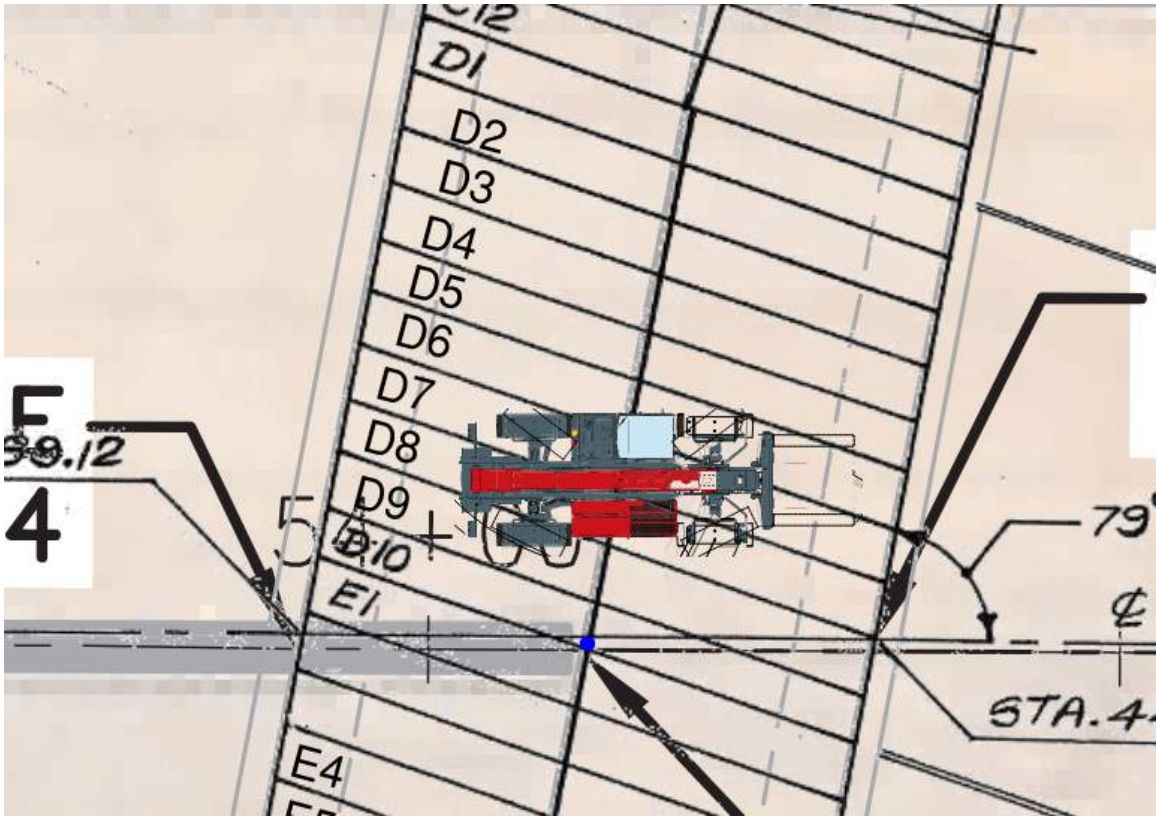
Position for Test 1 and Test 2 at Runway Bridge.
